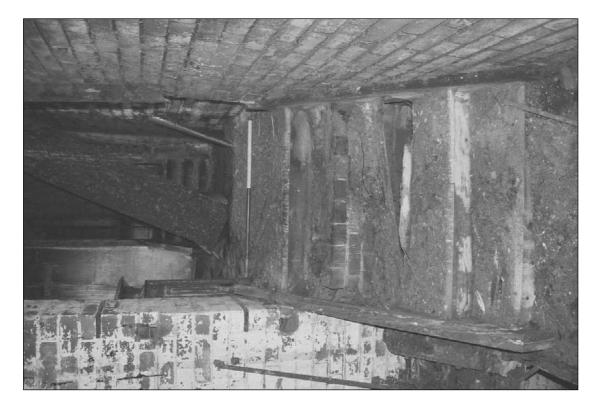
Detail of timber stairs leading to/from S4, northwest corner of S5 (film 44.23)
